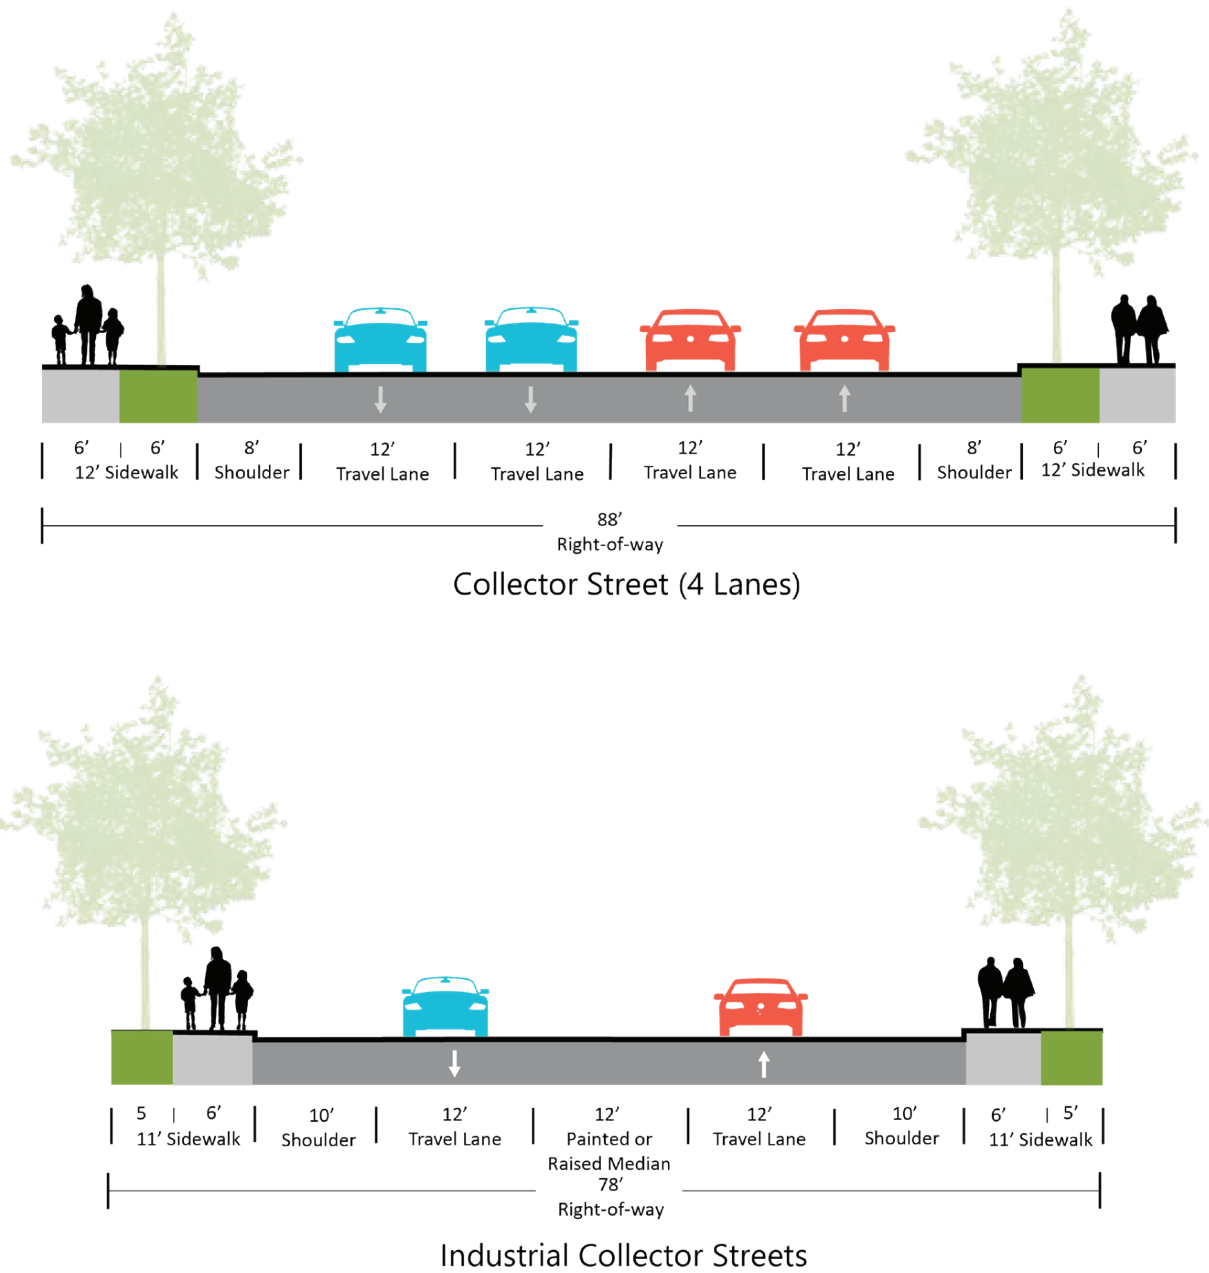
Roadway Cross Sections - Collector Streets
